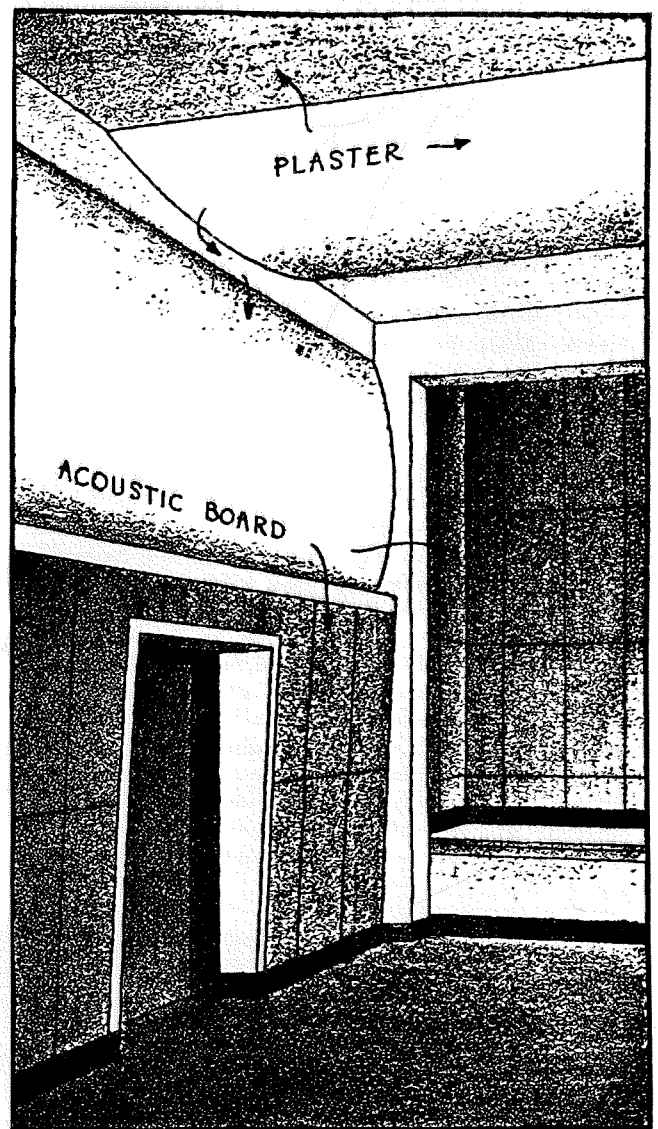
Acoustic treatment of ceiling with convex panels—Pentagon Building.
